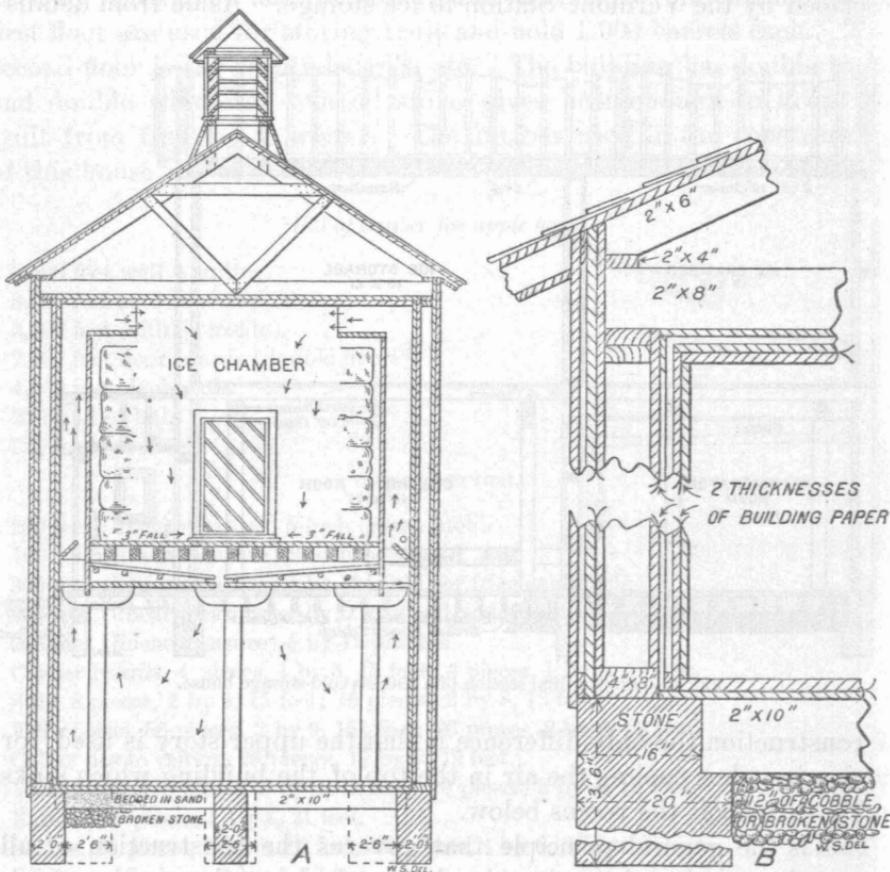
A, Cross section of a Kansas cold-storage house; B, Details of construction.
